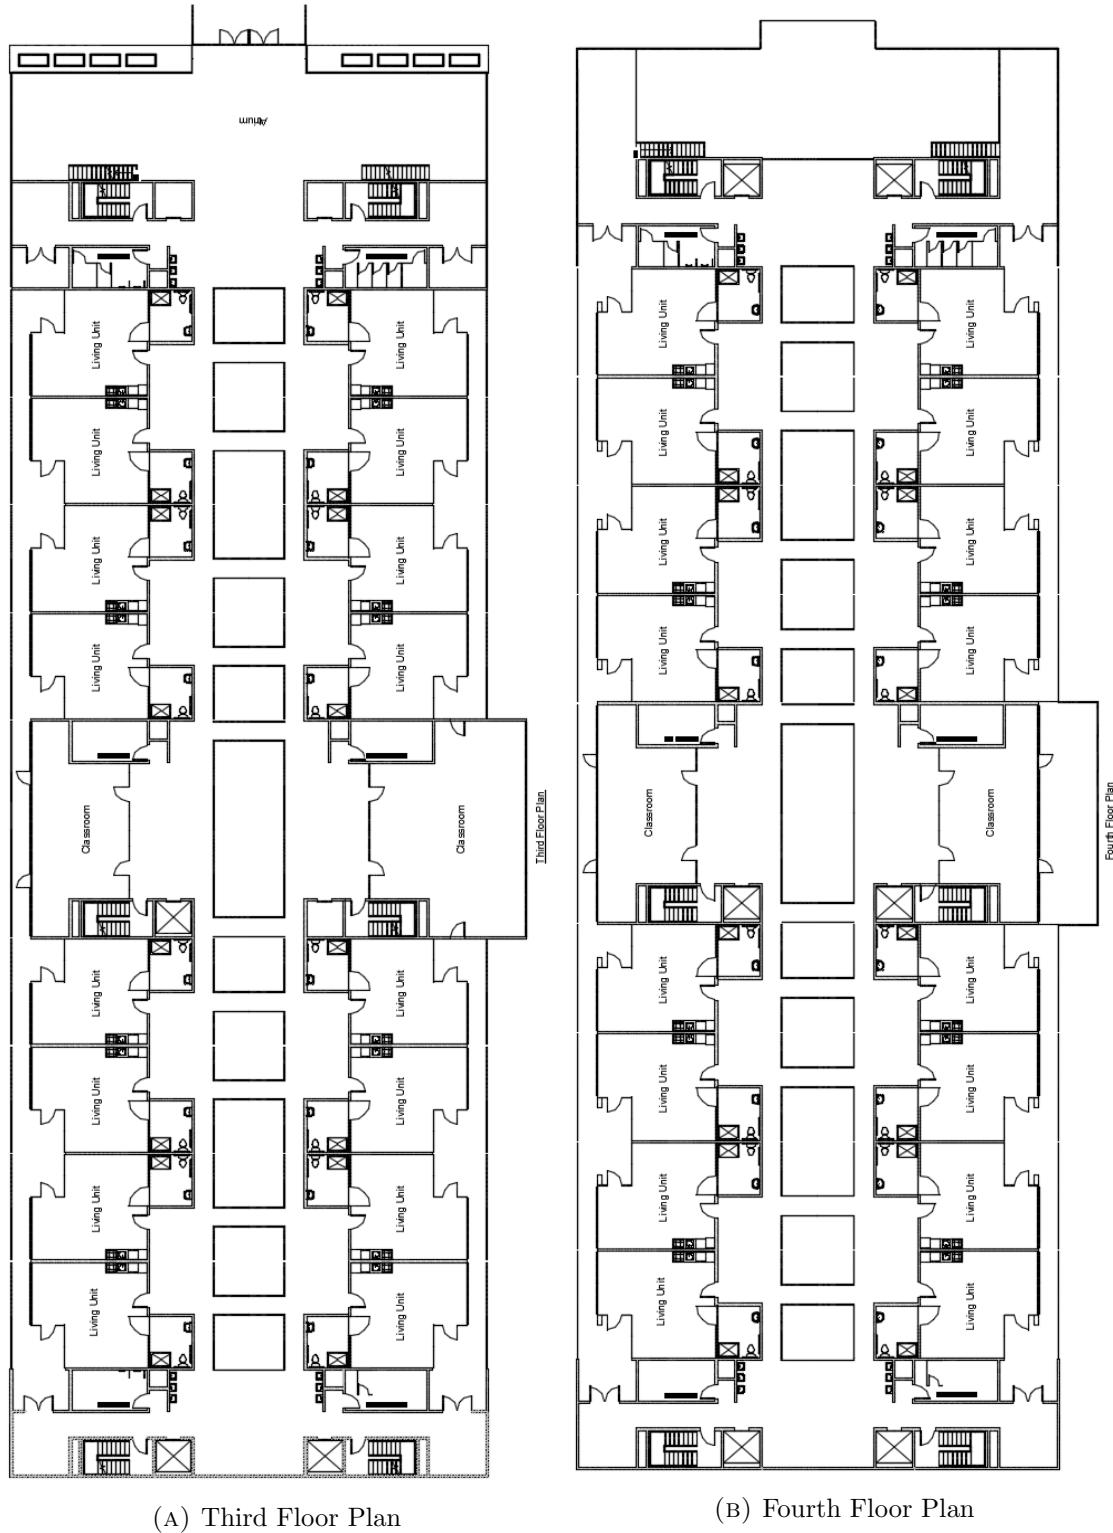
FloorPlan, Third Floor and Fourth Floor
